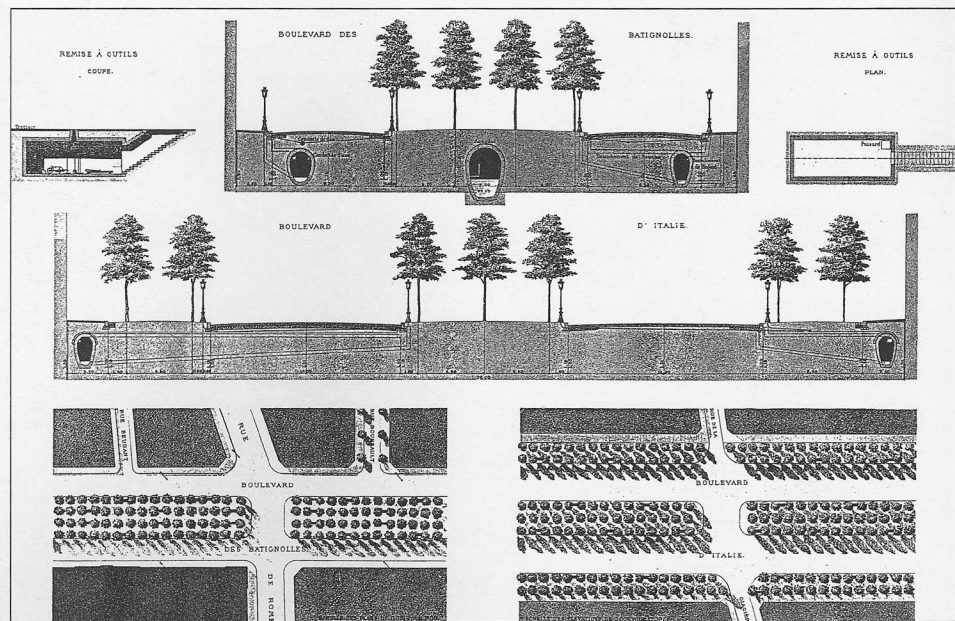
A plate from Alphonse de Gasparin's *Les Promenades de Paris*, showing the Boulevard des Batignolles and Boulevard d'Italie in plan and section. The technology of Haussmann's streets includes regular planting, gas lighting, water mains, drains, and sewers.
